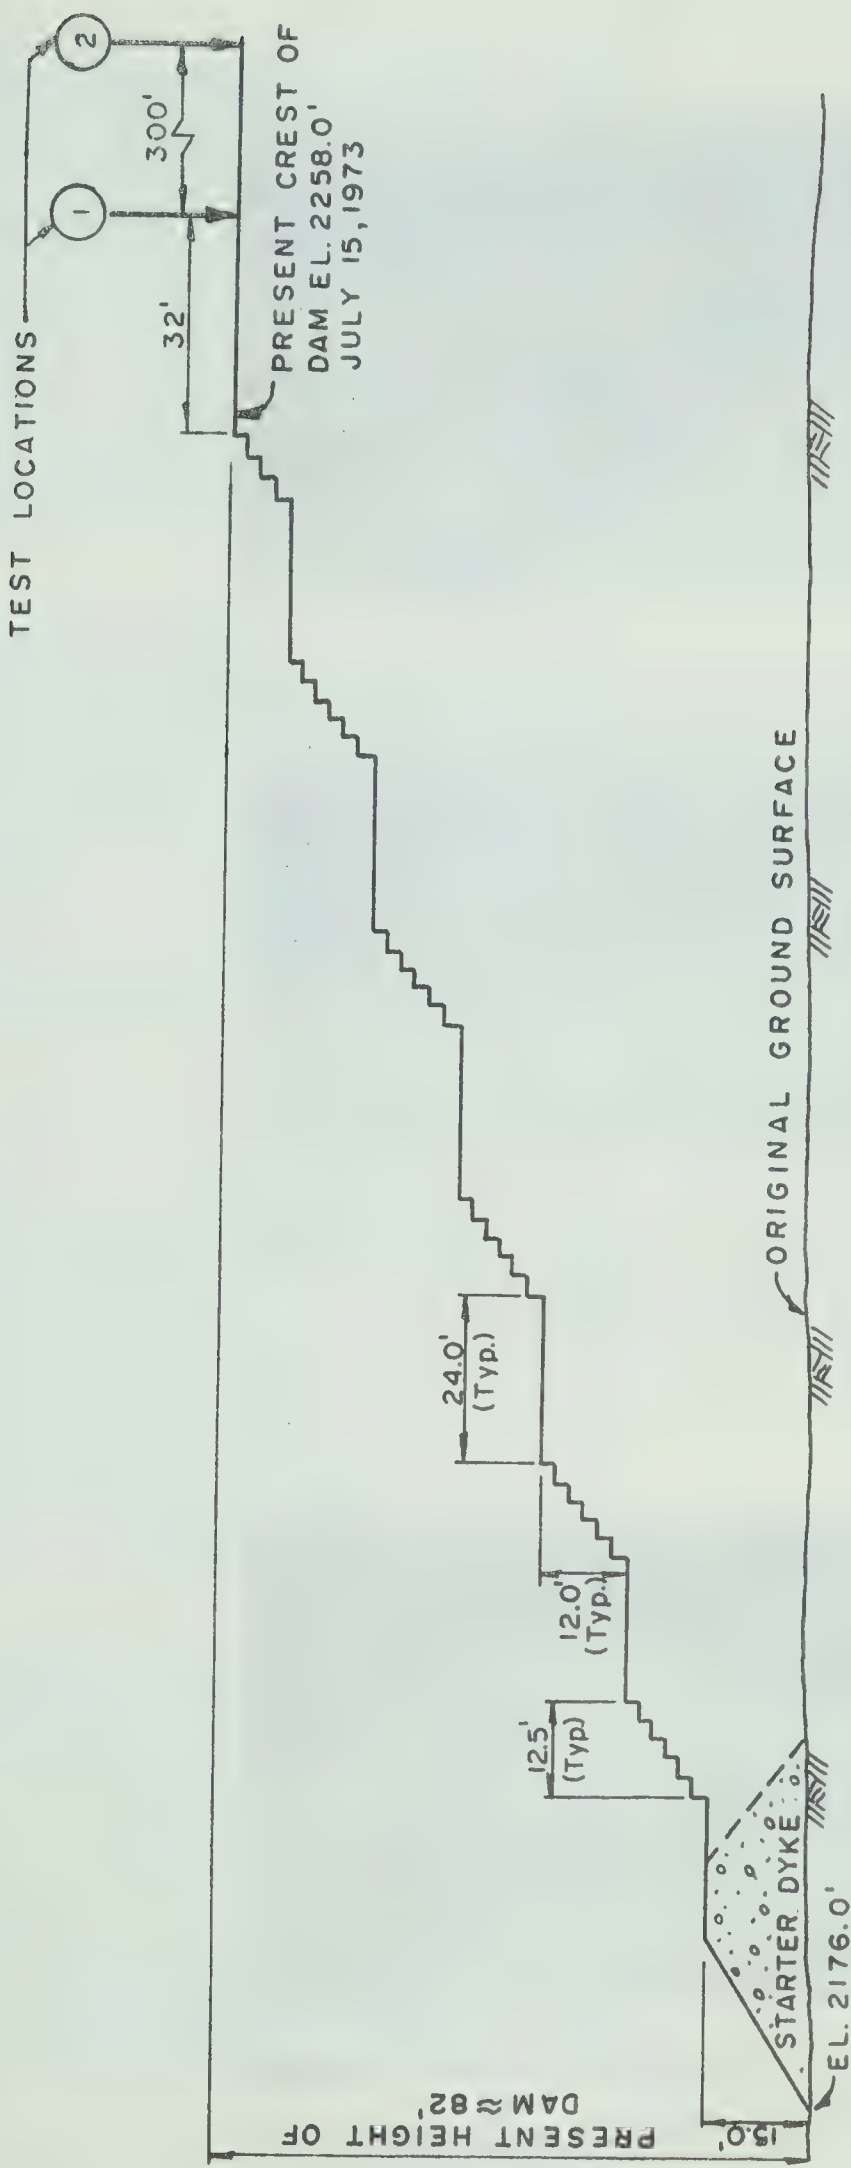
Typical Section Craigmont Tailings Dam at Test Locations Situated Approximately 1130 feet From East End of Dam
